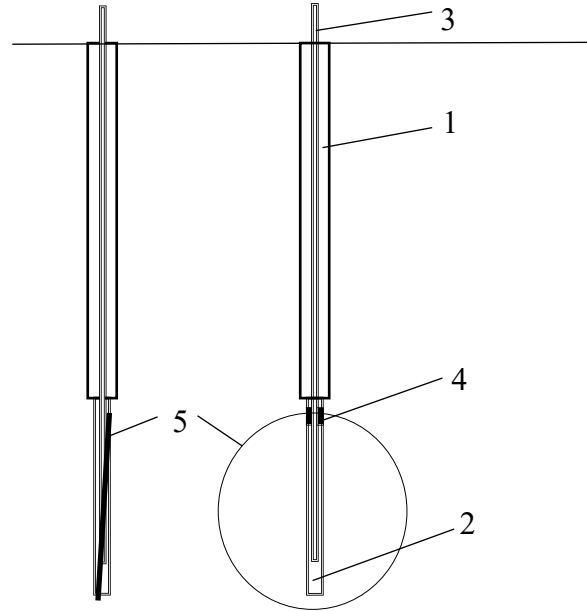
Hydrofracturing the Dry Well (1 Lined Well Section; 2 Open Well Section; 3 Fracturing trummy pipe; 4 Pressure Seal; 5 Planar fracture in plain view and in side view).
